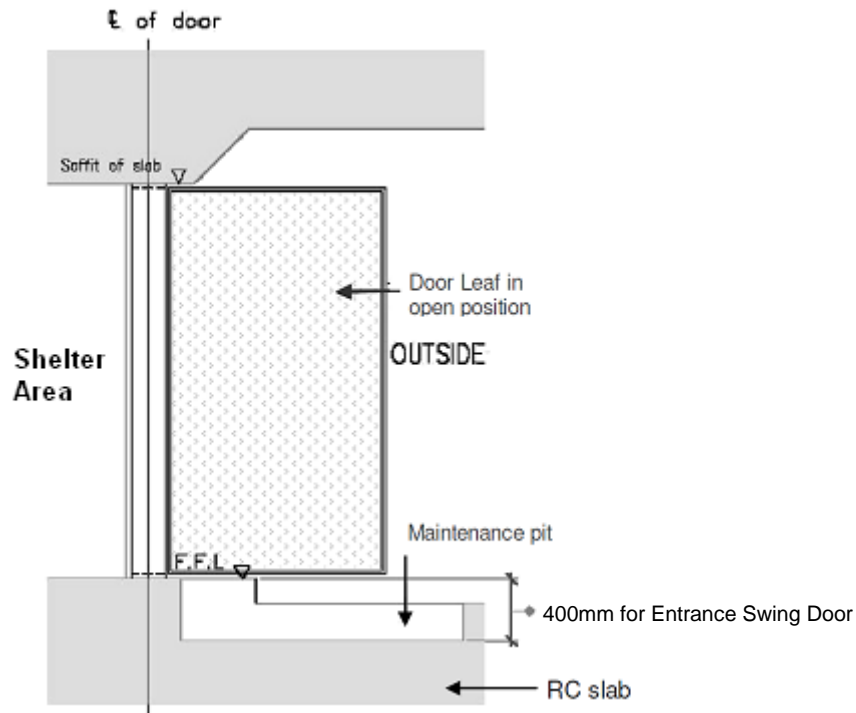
Sectional elevation view for large steel swing door with maintenance pit
